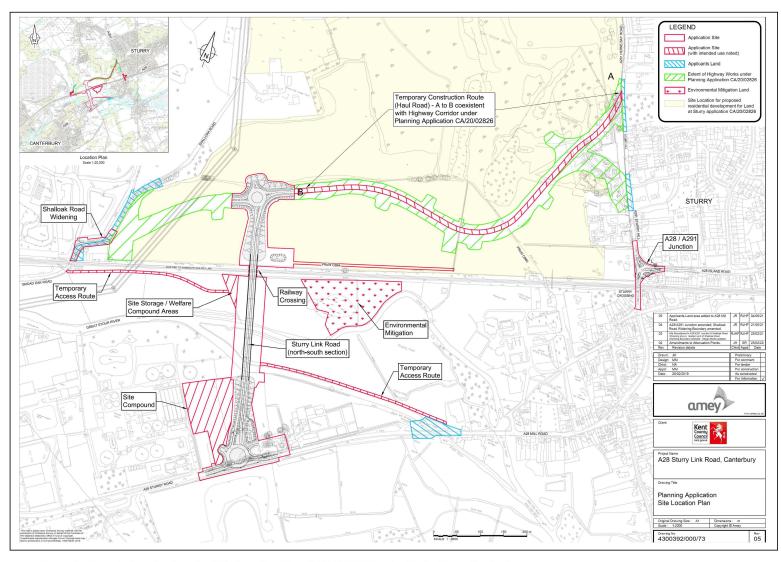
Extent of application site (Site Location Plan 4300392/000/73 submitted with application)
